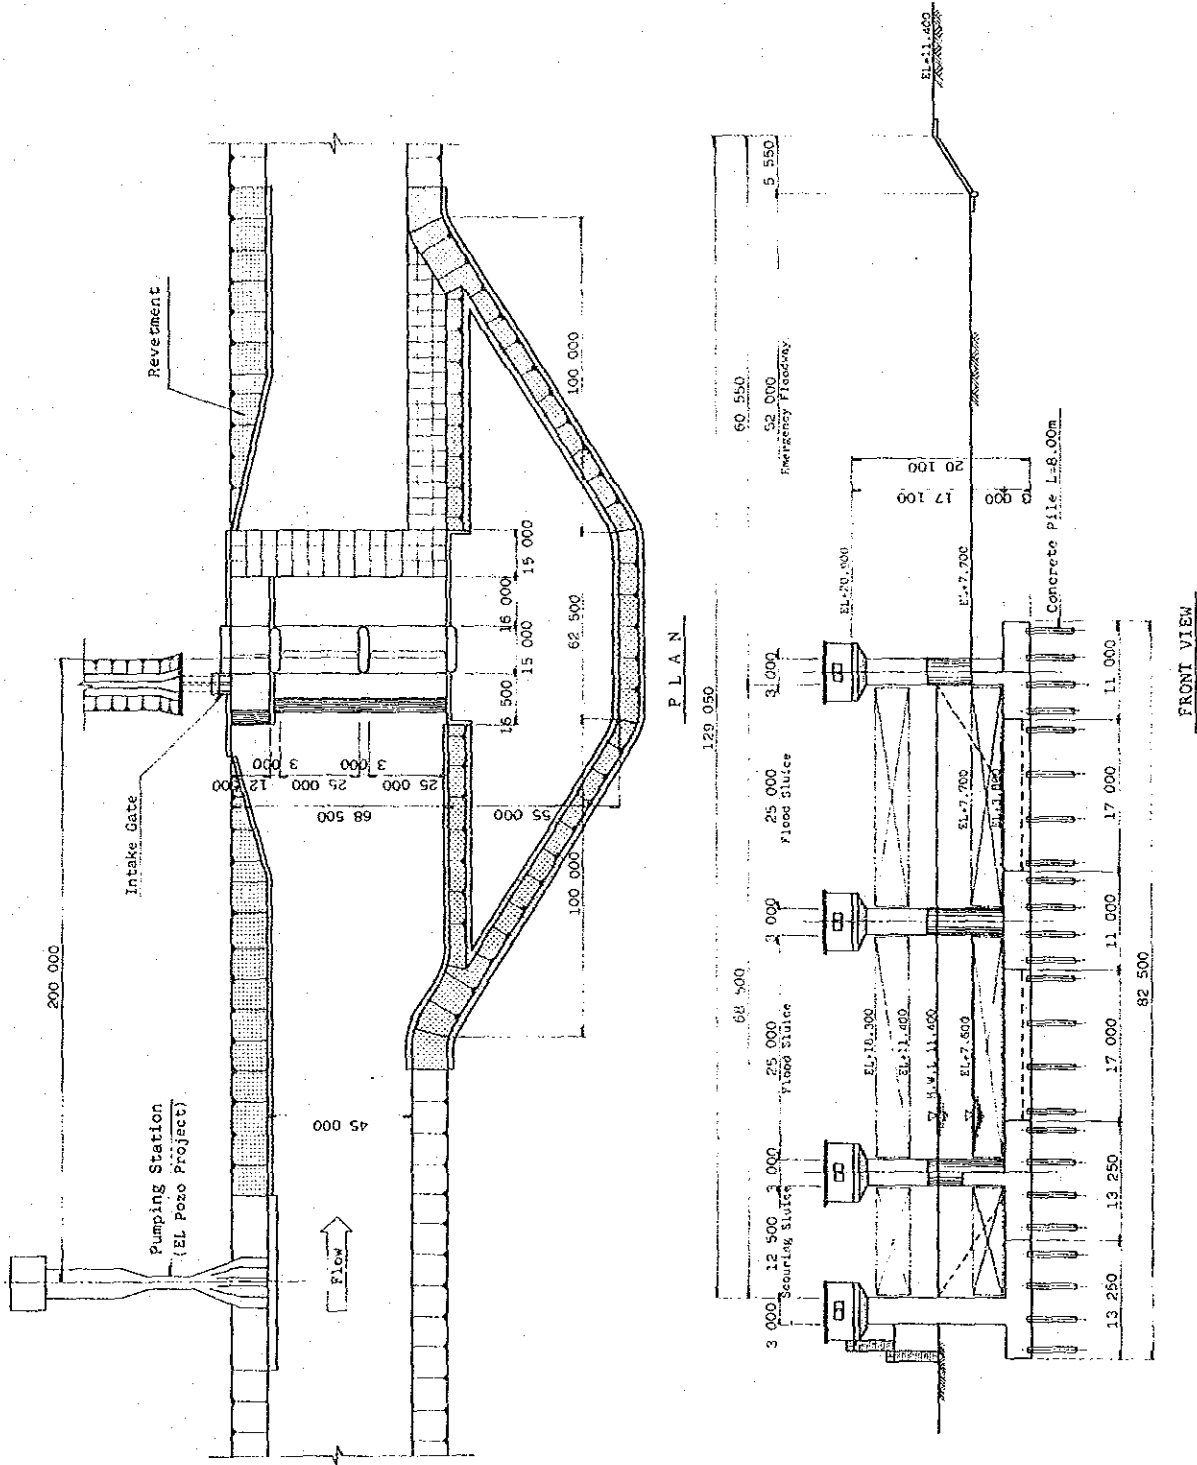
GENERAL PLAN OF HEADWORKS (1/2)
